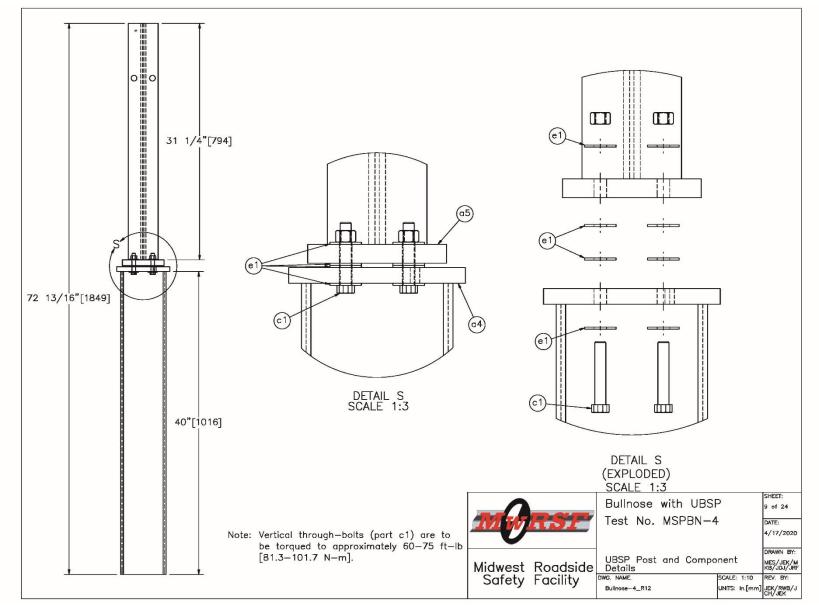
UBSP Post and Component Details, Test No. MSPBN-4
